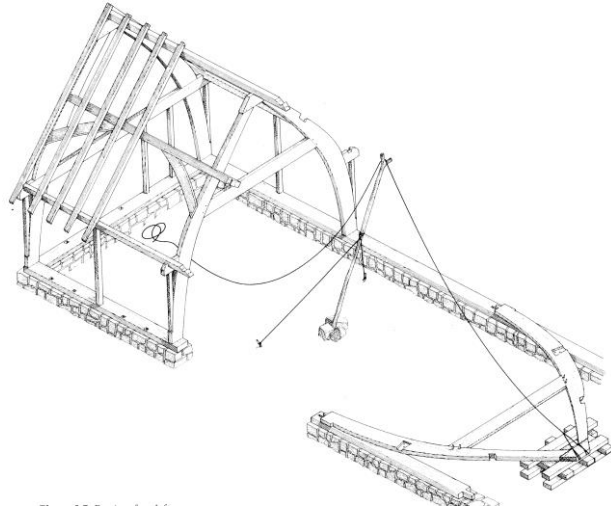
Image showing erection of Cruck frames (Sunley and Bedding, 1985)
